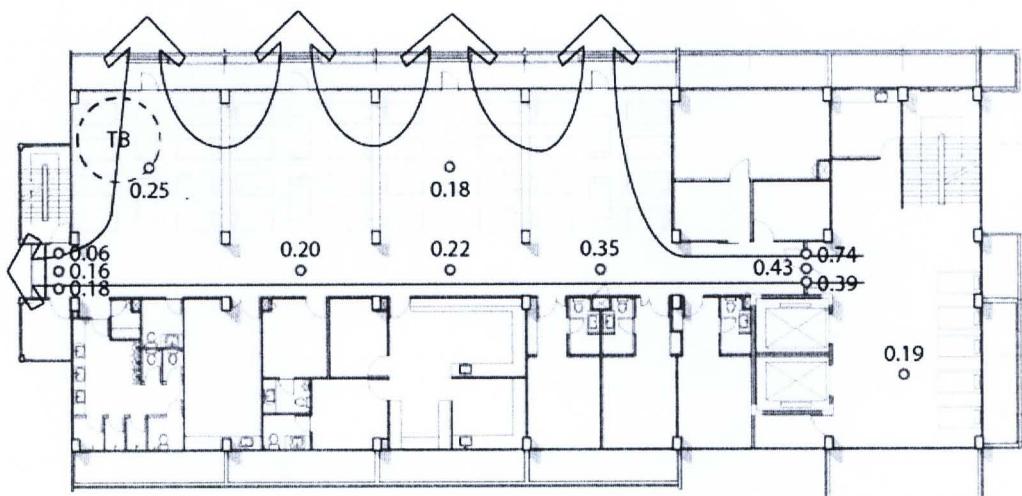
Floor plan and ventilation data of hospital B inpatient ward
